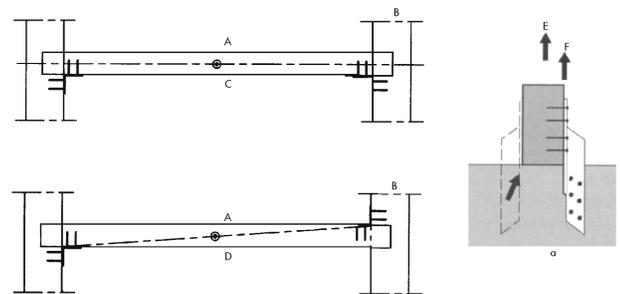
Anchoring of a purlin by means of purlin anchors and nails
